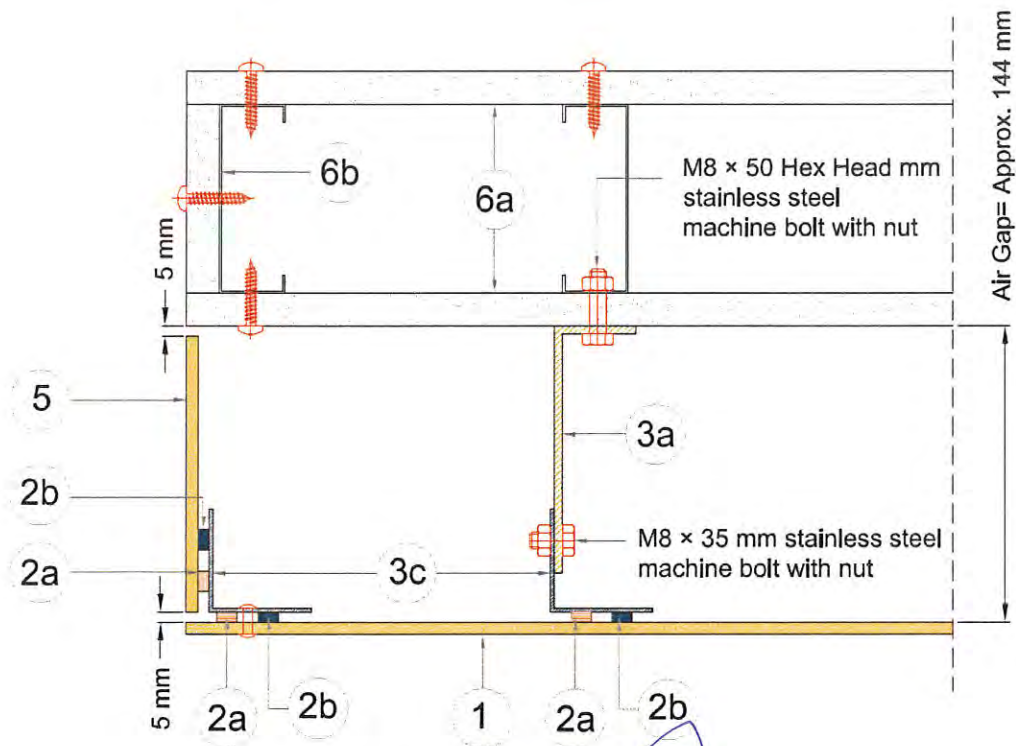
Non-load-bearing exterior wall cladding assembly typical horizontal window section details
